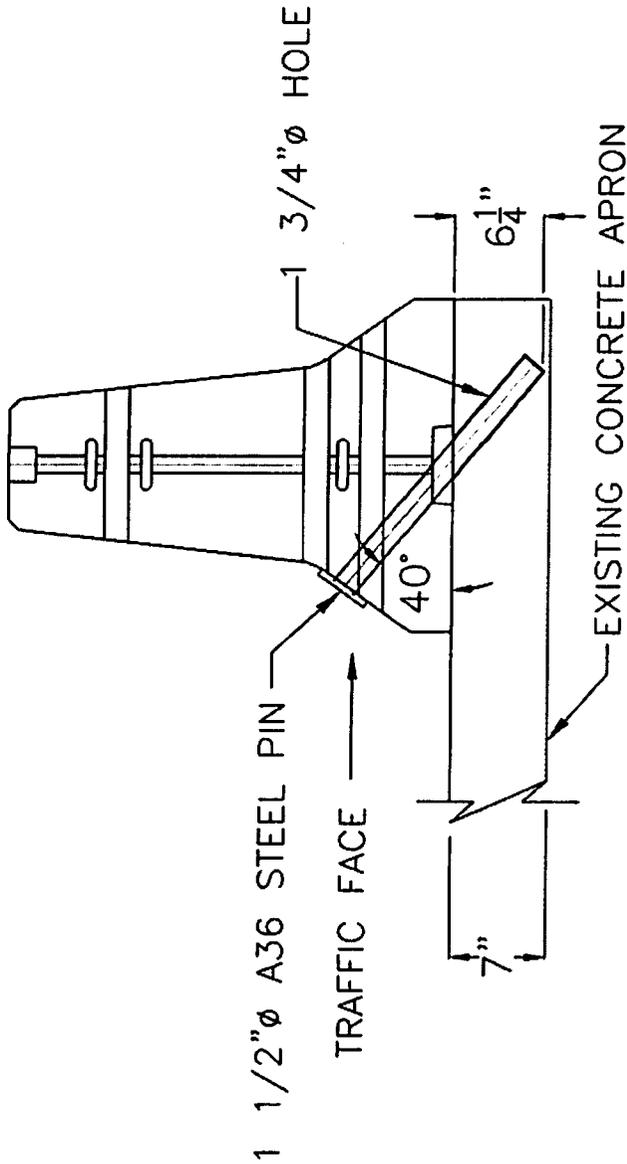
Details of the pinned F-shape barrier – installation layout.
